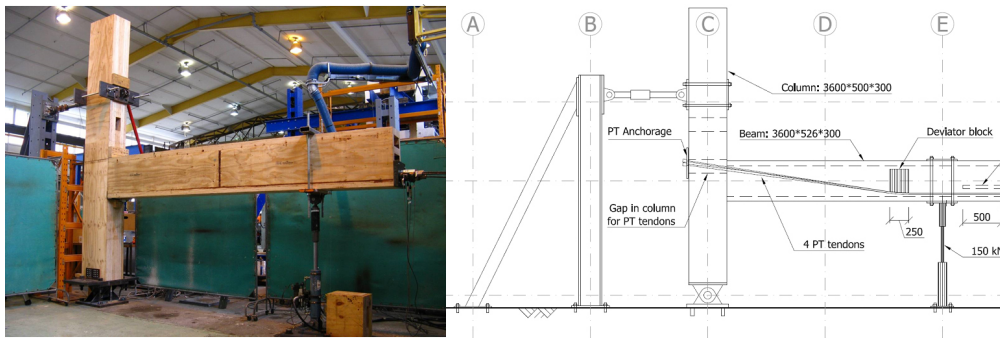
Test setup and diagram for draped tendon beam column test (van Beerschoten, 2013)
